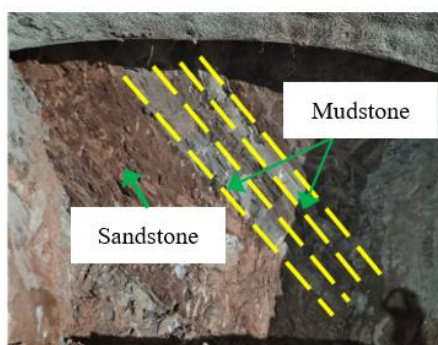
Joint Condition of rock mass in the on-site tunnel
